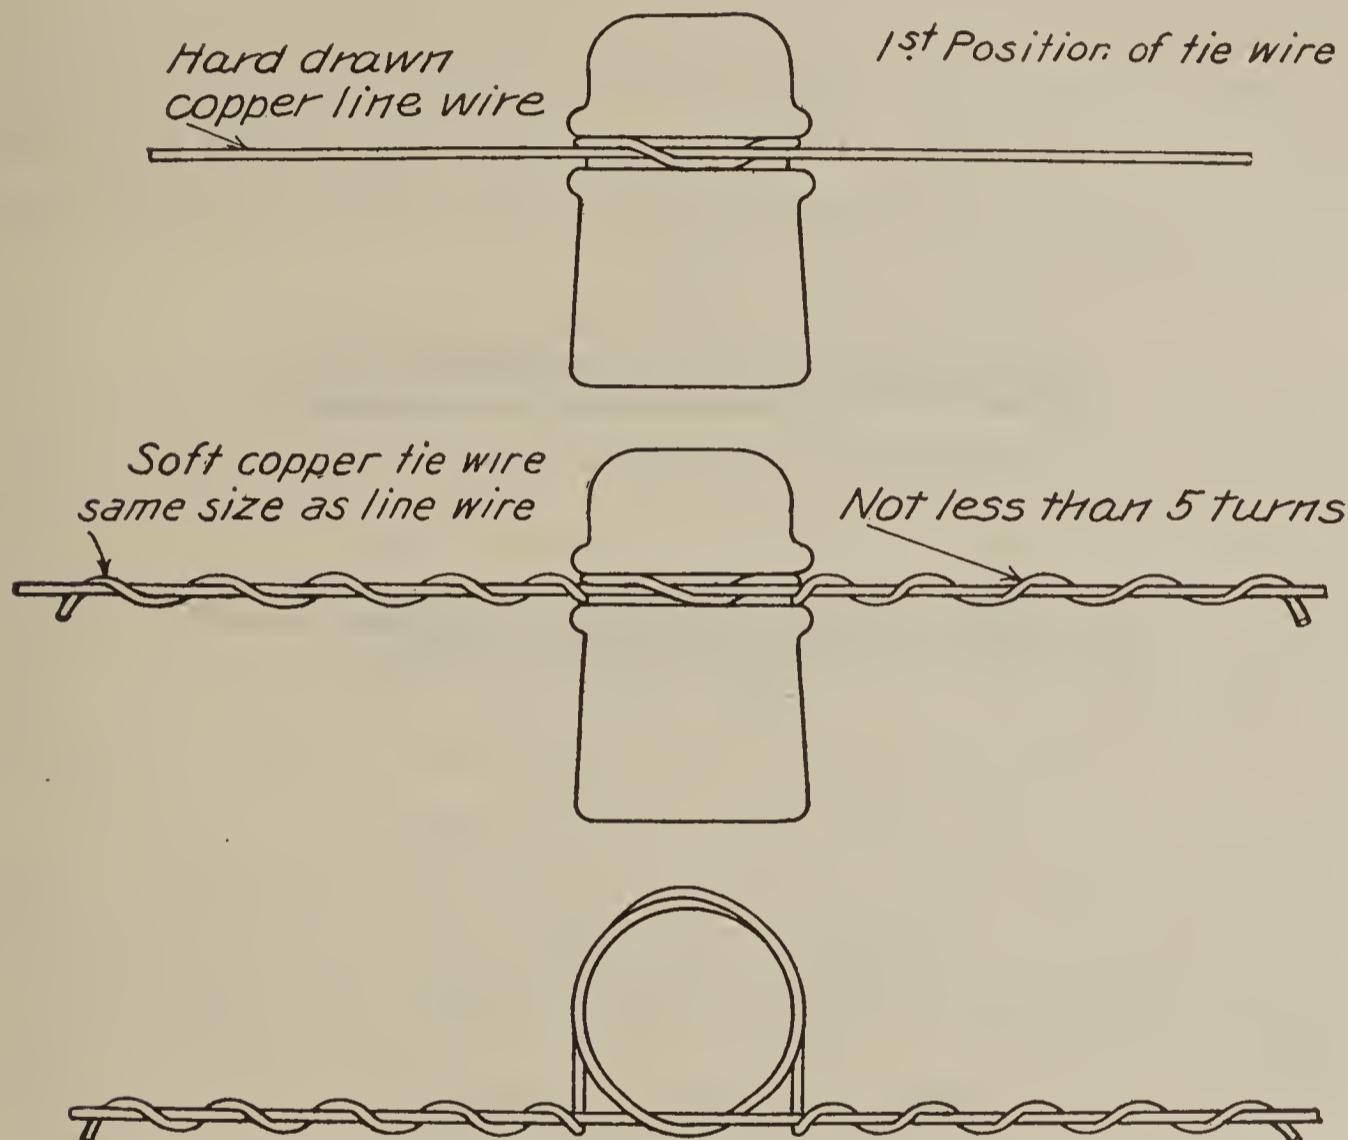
Method of making "figure 8" tie for hard-drawn copper wire.
